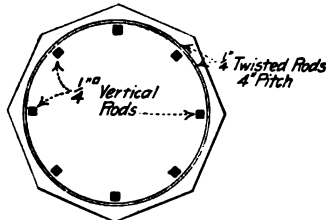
Hooped Column, Kelly & Jones Factory.
